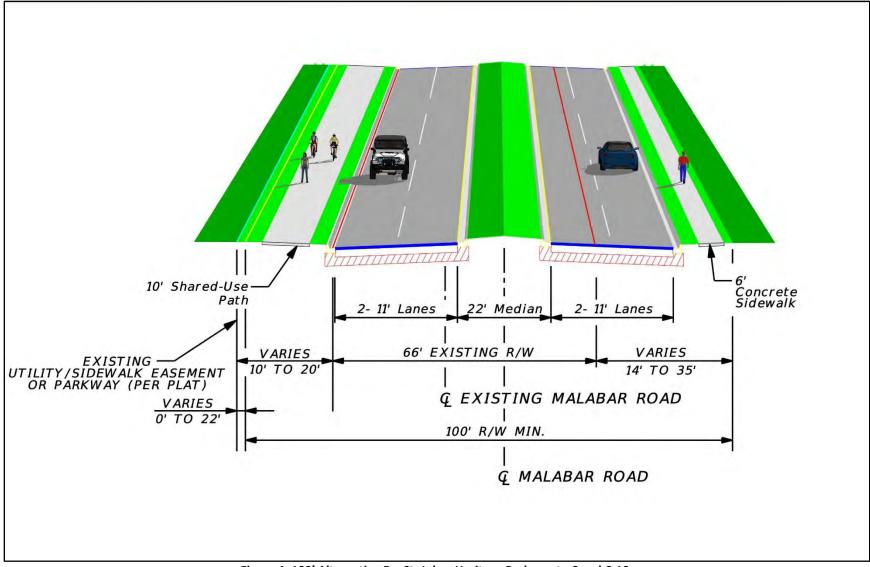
100' Alternative B – St. Johns Heritage Parkway to Canal C-10
